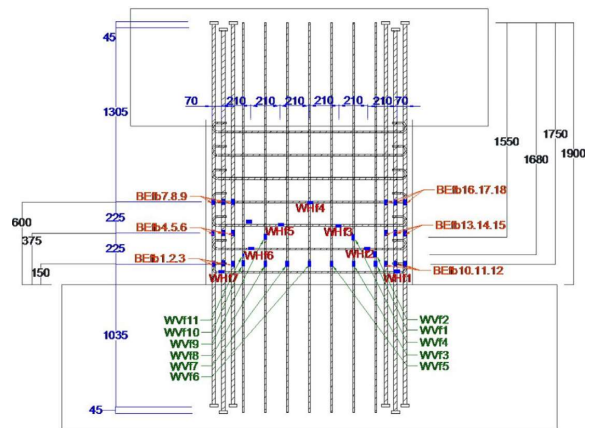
Typical reinforcement details for wall with high-strength reinforcement
